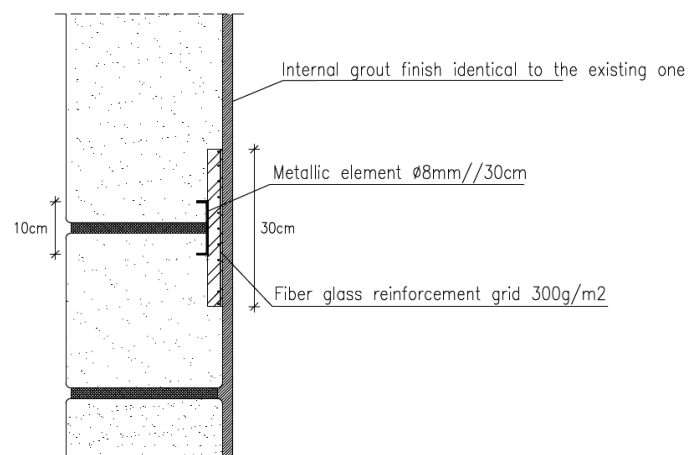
Detail of the metallic element that connects the steel bar to the truss
